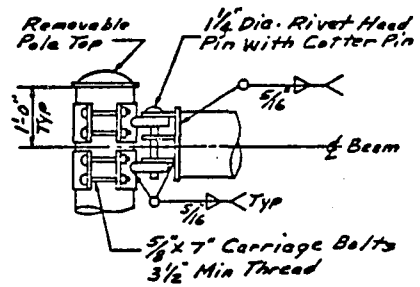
Typical Monotube Structure Beam-to-Column Connection
